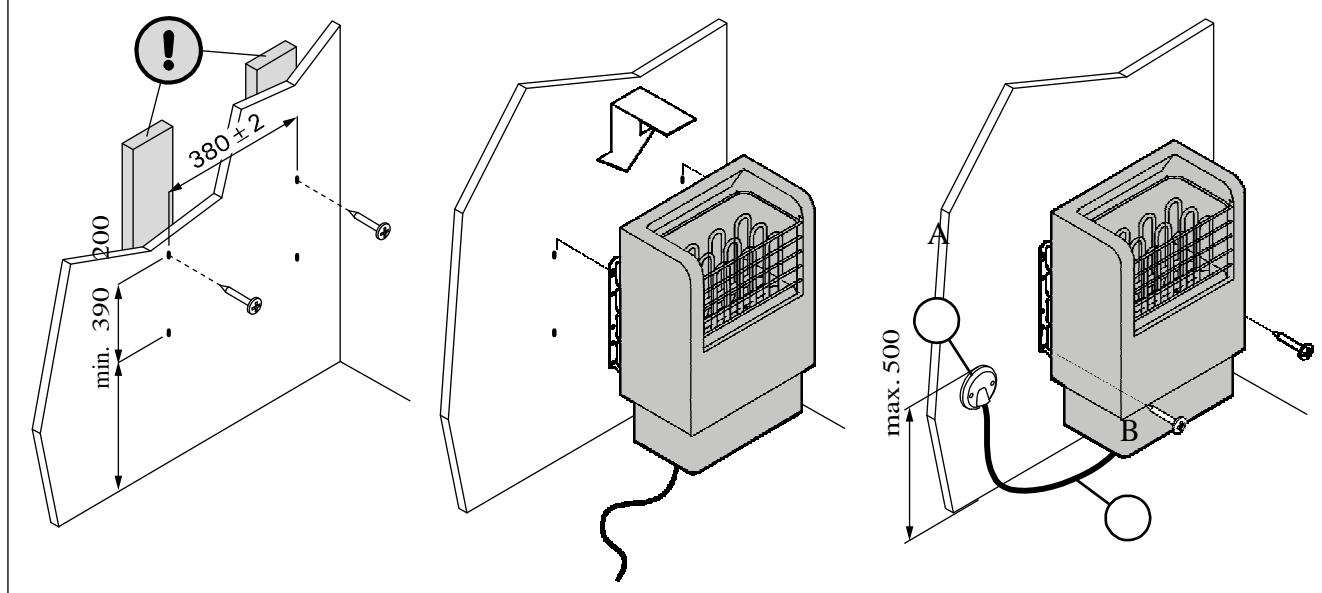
Fastening the heater on a wall (all dimensions in millimeters)
